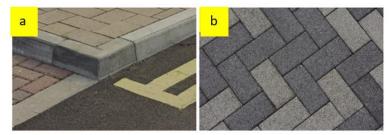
Applications of recycled concrete in streets. Source: (Groves, 2023)
